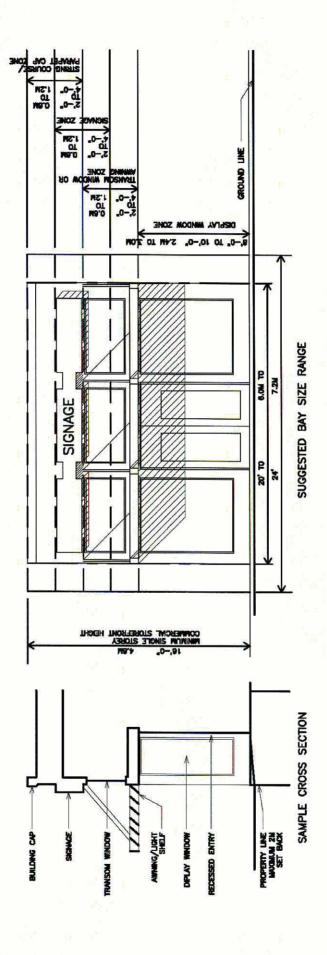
Sample Front Elevation - Single Storey Commercial Building Face Design Elements
